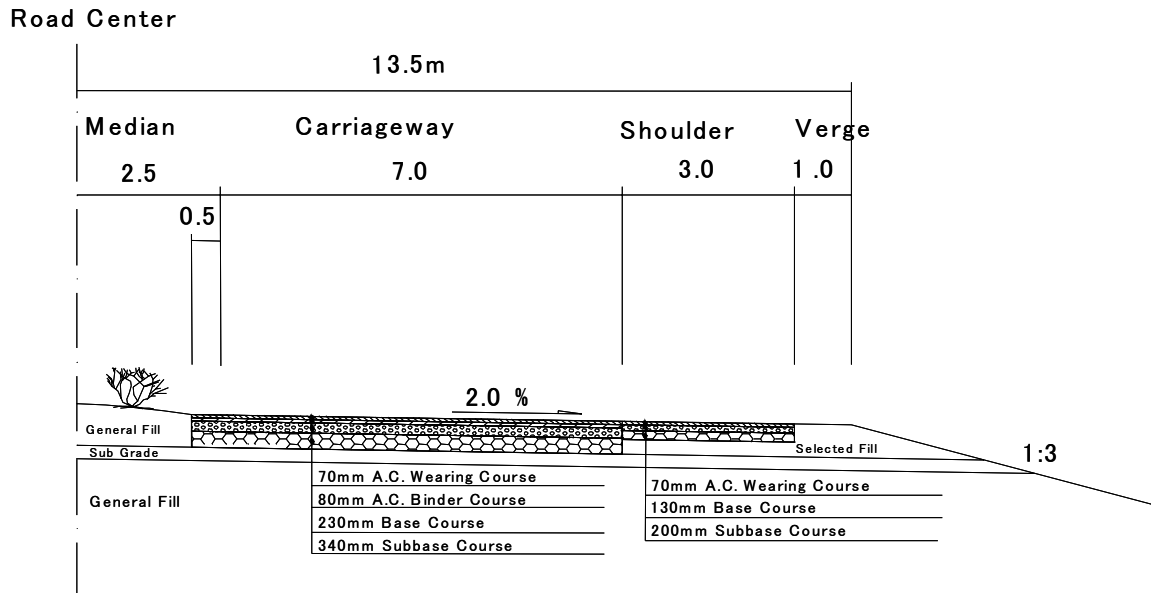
Typical Cross Section for Pavement of Embankment Carriageway
